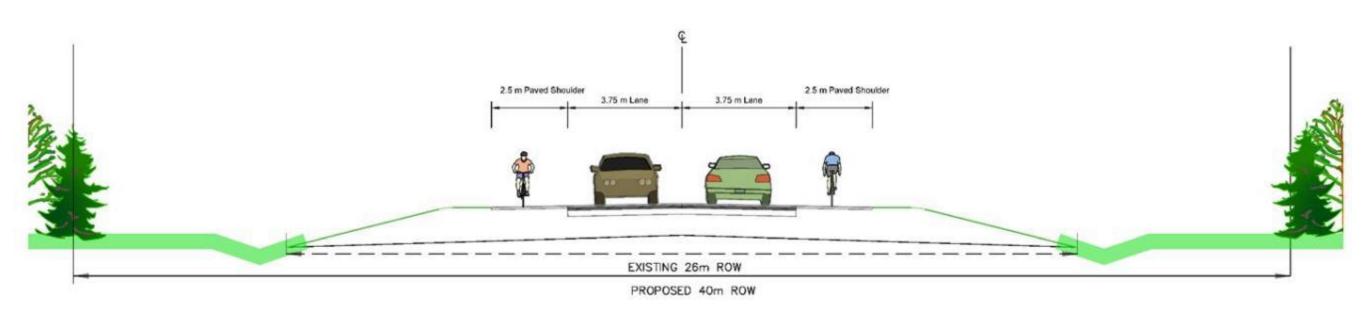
Section 3 Alternative 1 - 2-Lane Rural Cross Section
